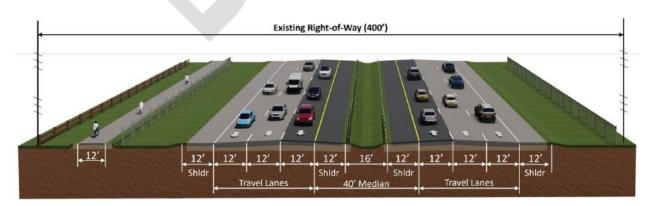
Build Alternative Typical Section – North of SR 54 to SR 52
